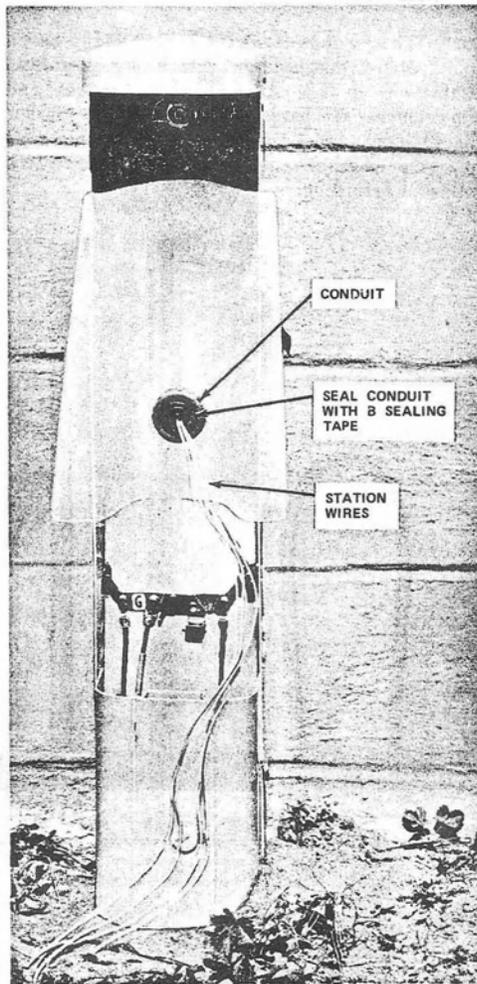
PC6/48 Cable Closure—Wall Mounted
